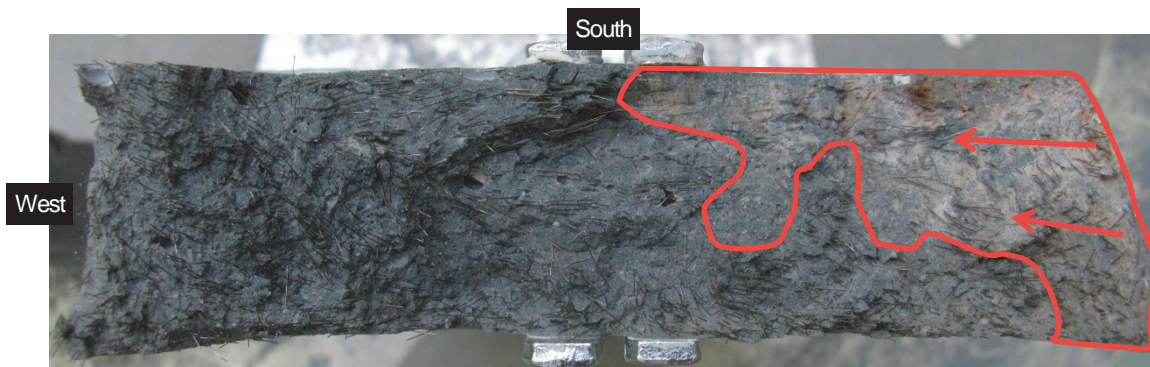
Fatigue fracture surface of S3-7 test specimen (upper half of the fractured specimen)
